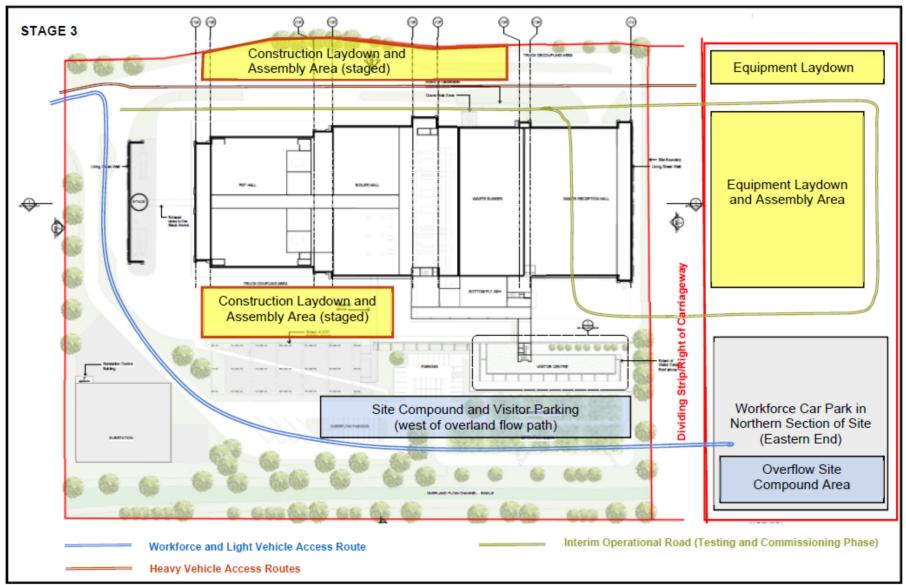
Indicative Site Layout Stage 3 (Ancillary Works, Testing and Commissioning, External Works)
